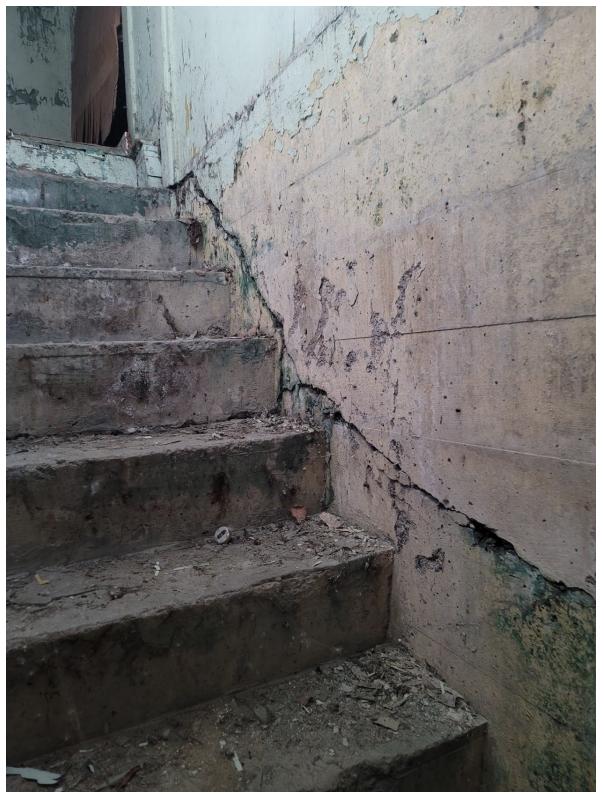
Detail photo of the stairs that lead from the interior of Building A to the basement in the south addition. The photograph shows the slope of the crack paralleling the stair slope as well as spalling, vegetative growth, and staining from water infiltration (©TNSDS 2023).
